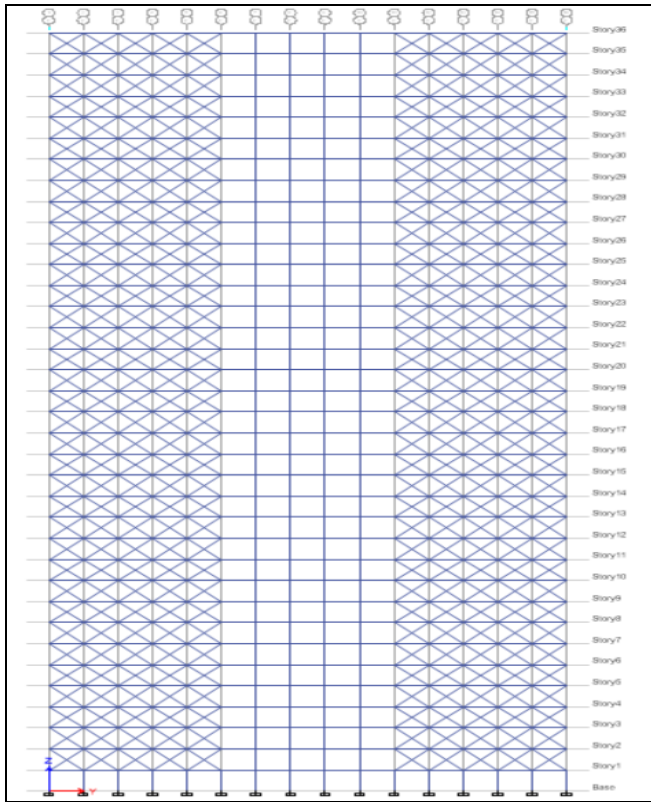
Elevation of model-1, with Diagrids connecting single storey.
